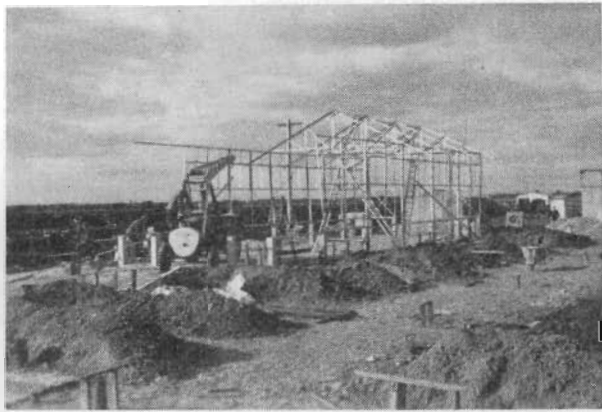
Prefabricated steel-framed workshop in course of erection at Horsham depot.
